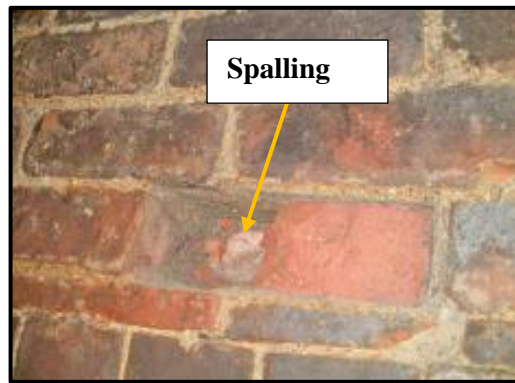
Spalling and missing brick works (W2822, 2014)
